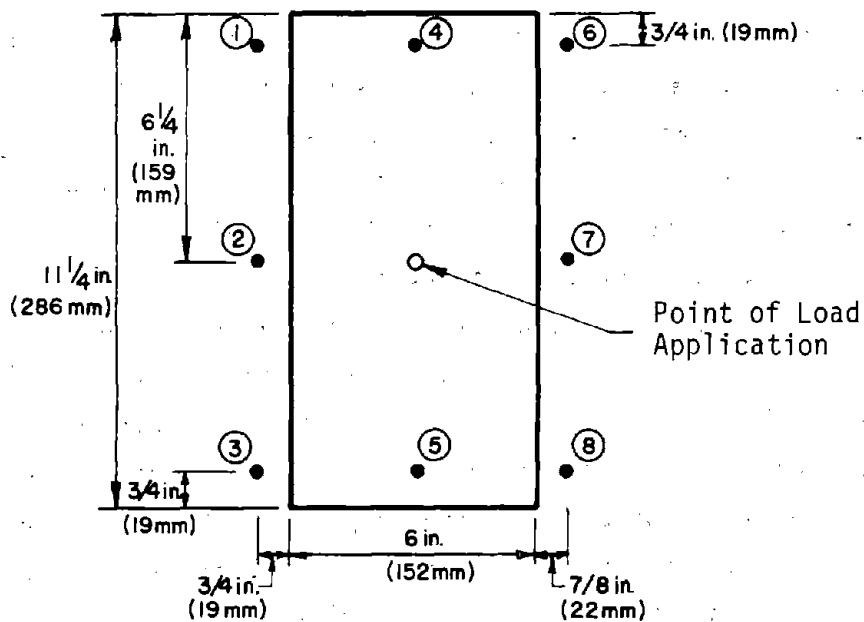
POSITION OF DIAL GAGES DURING IN-SITU PLATE LOAD TESTS FOR ARCHES 1 TO 6
